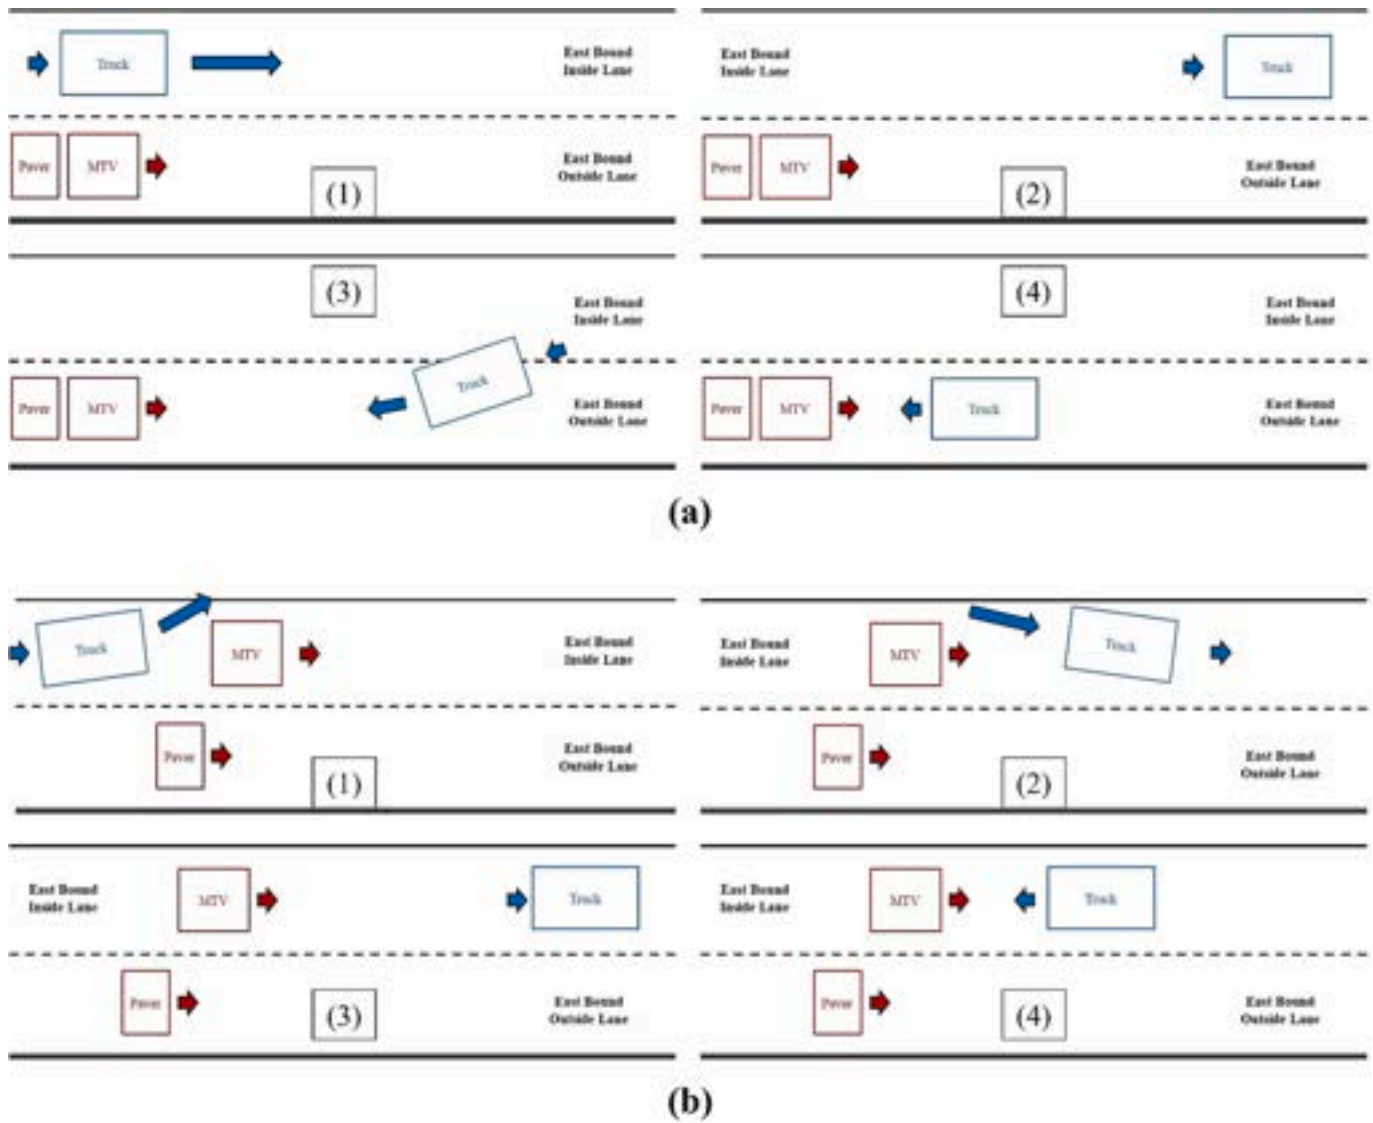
Schematic of asphalt feeding sequence to Material Transport Vehicle (MTV) and paver in SH21 rehabilitation project: a) typical arrangement initially used in non-instrumented sections; and b) revised arrangement adopted to minimize damage to geosynthetic.
